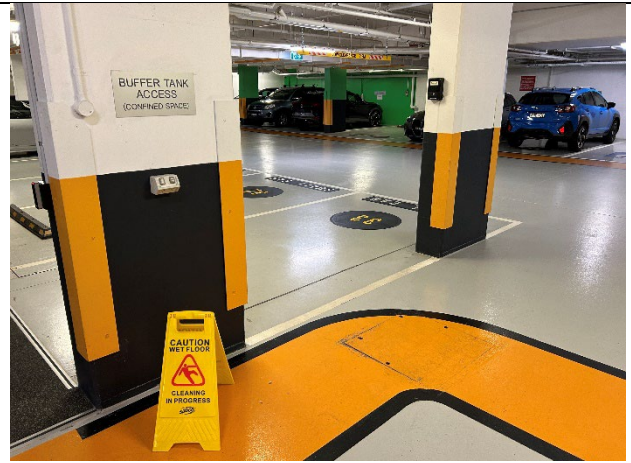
Level B2, carpark, adjacent space 33, buffer tank.
